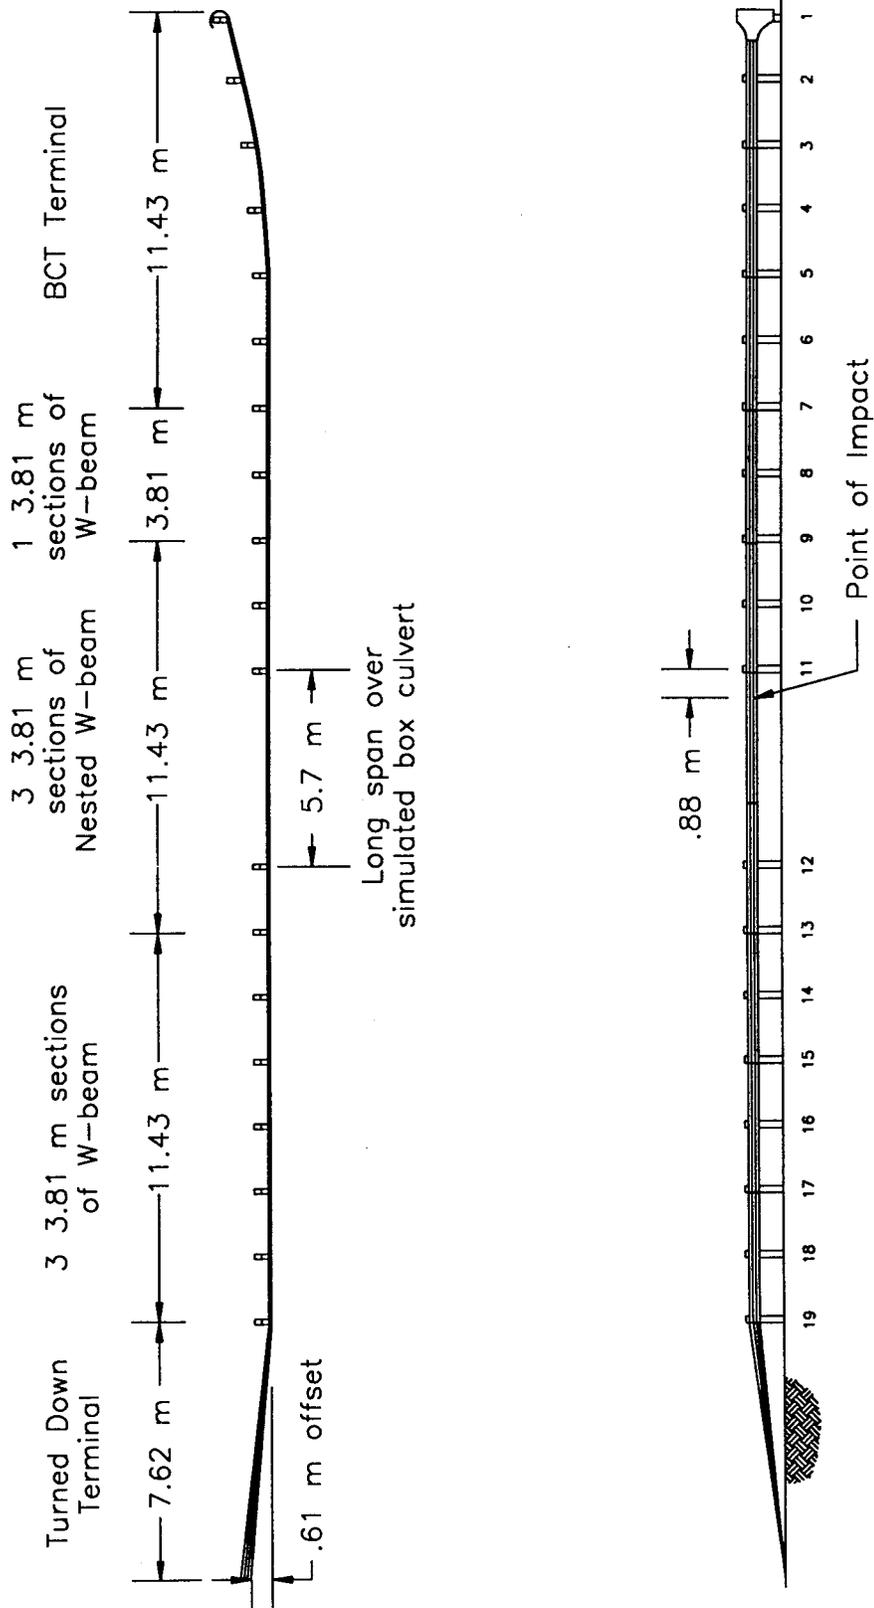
Washington nested W-beam wood-post guardrail with two posts over culvert for test 7147-5.
